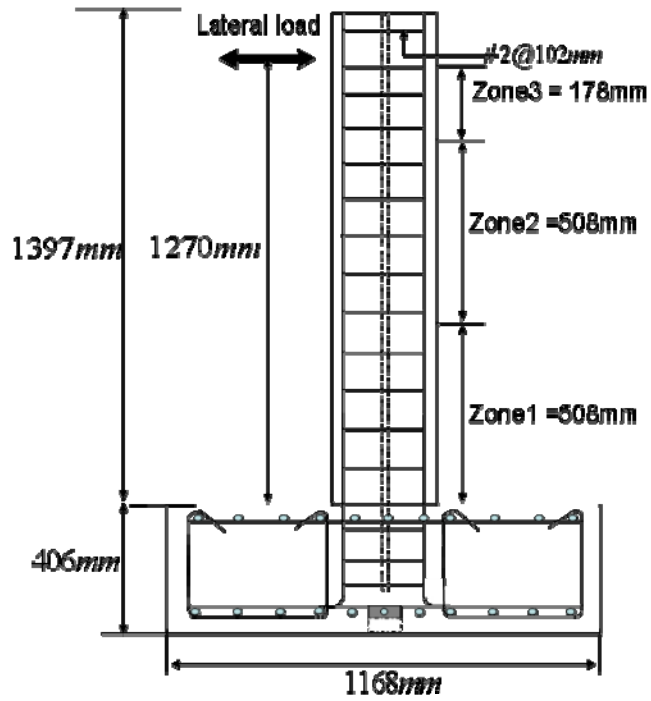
Details of reduced-scale reinforced concrete column used in testing.
